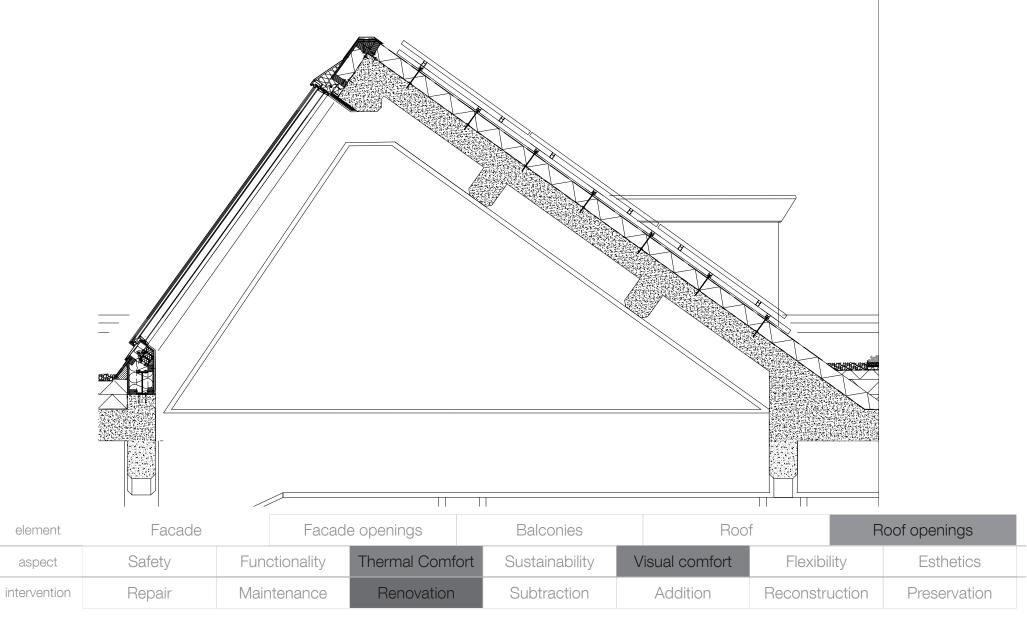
Detail of the replacement of the rooflight windows, source: own image
